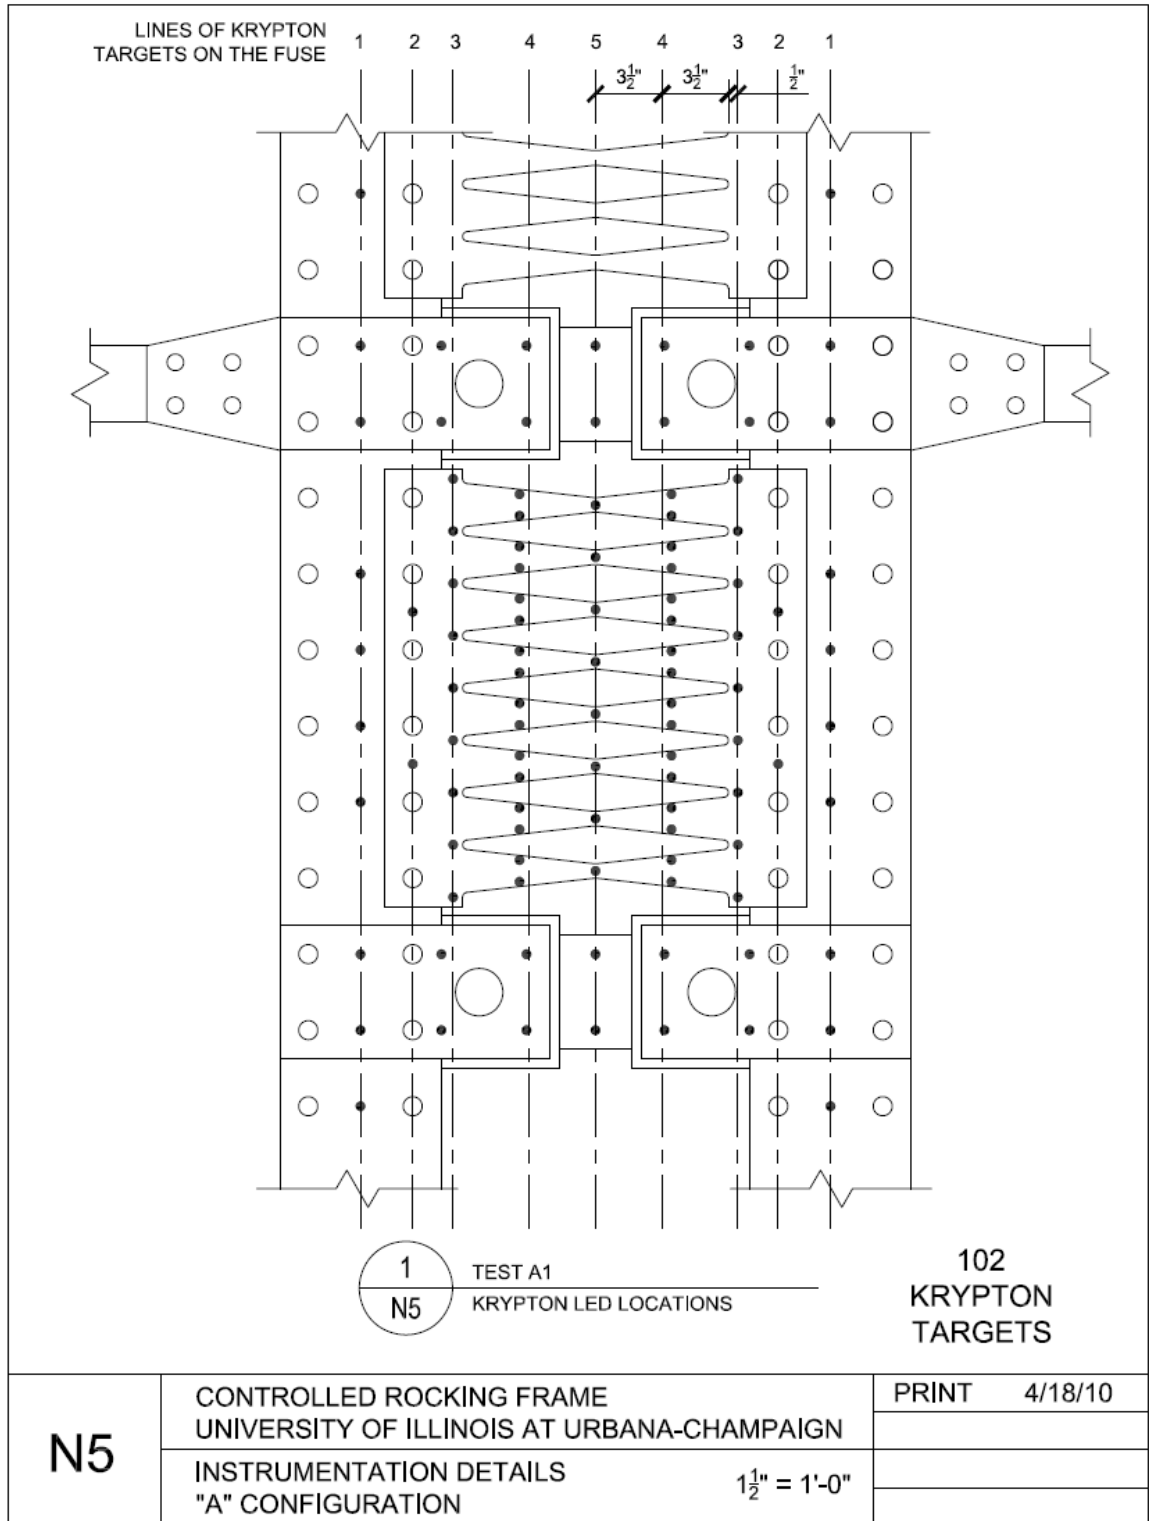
Instrumentation Plan Drawing – Krypton LED's for Specimen A1
